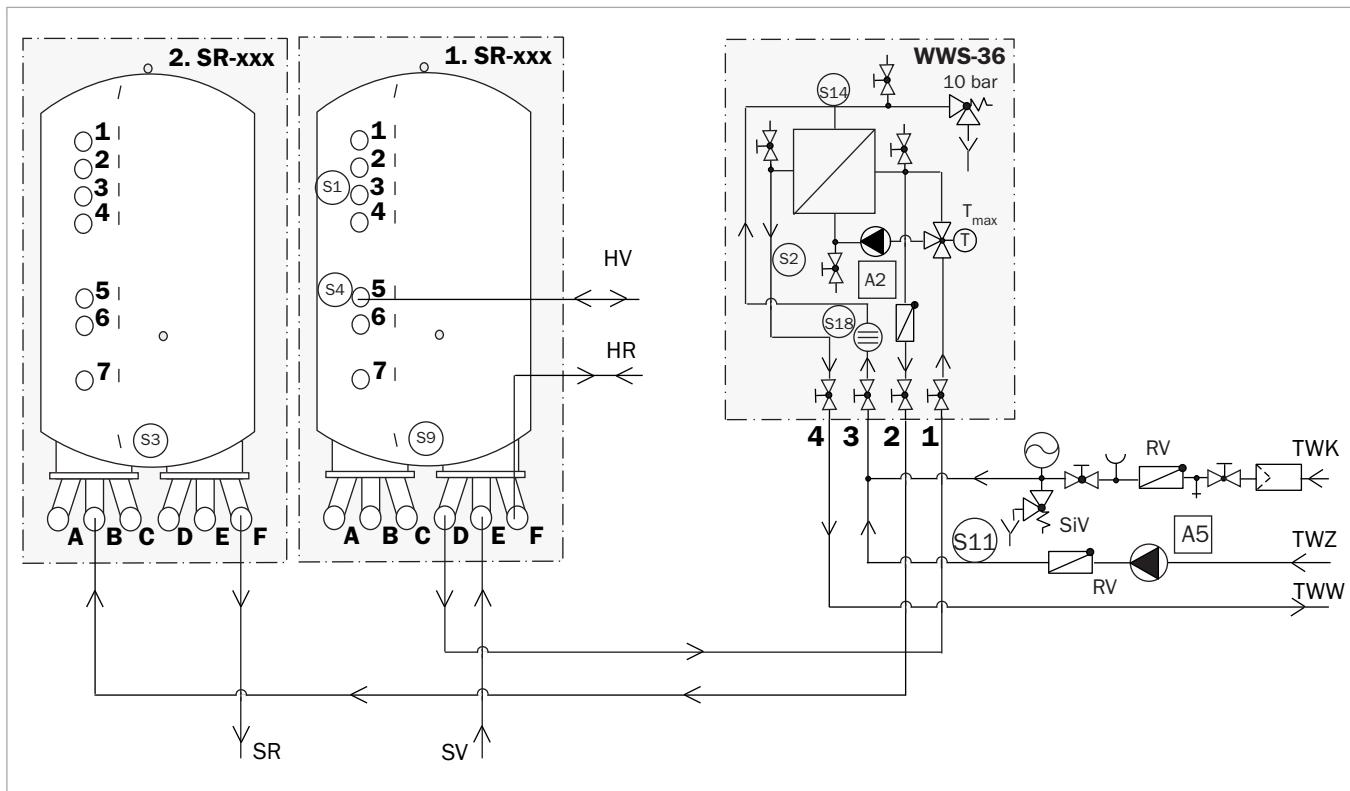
Connection of the WWS-36 hot water station to the SolvisDirekt2 system with two storage tanks
